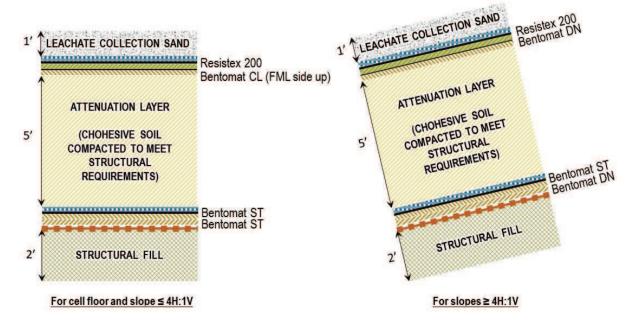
Proposed MC VI-G Phase 2 Base Liner Construction Detail.
